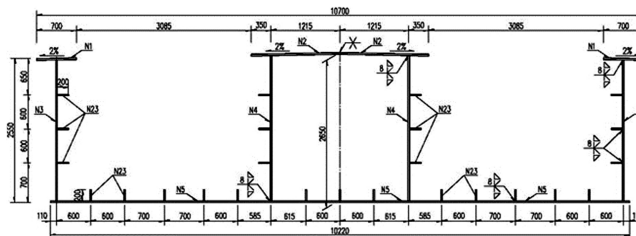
Cross-sectional diagram of the main bridge of Jinzhou Bridge (3) (mm)
